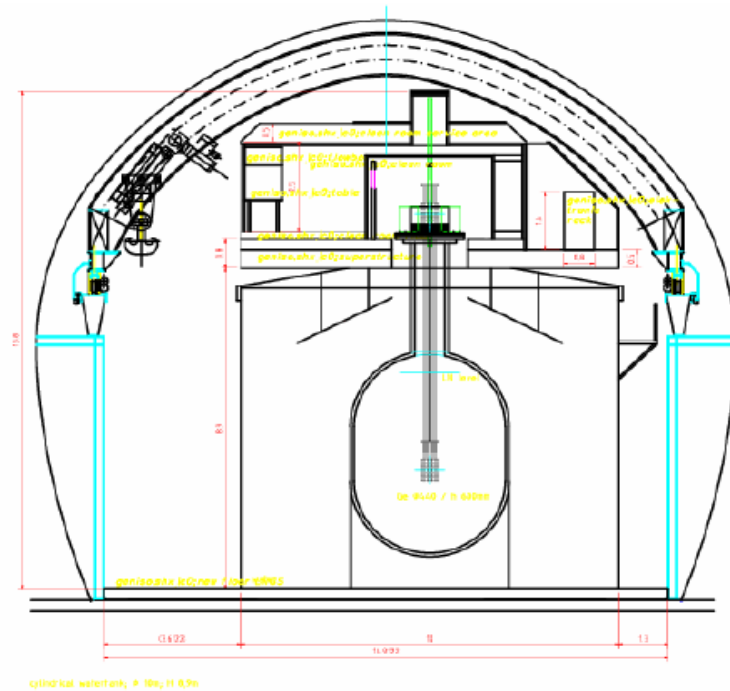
View of GERDA cross section from TIR tunnel. The shielding structure below the roof of the water tank might be not needed.
